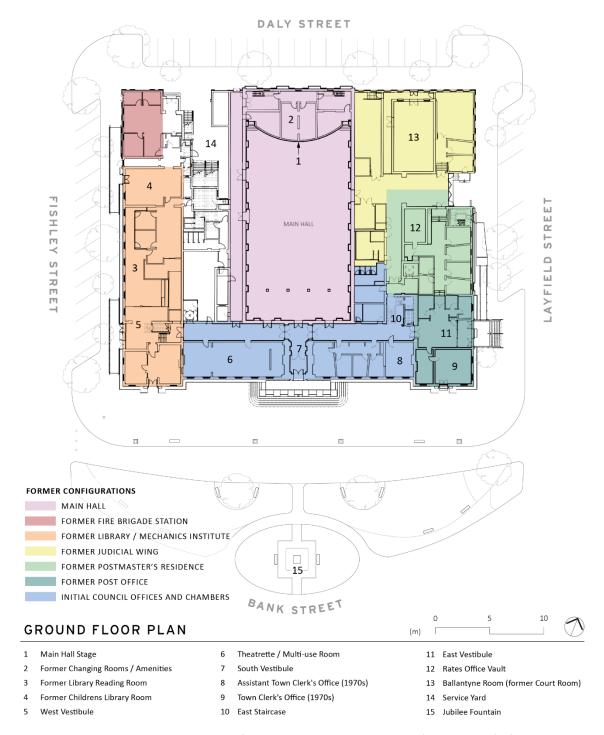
Existing conditions ground floor plan overlaid with locations (approximate) of original functions
